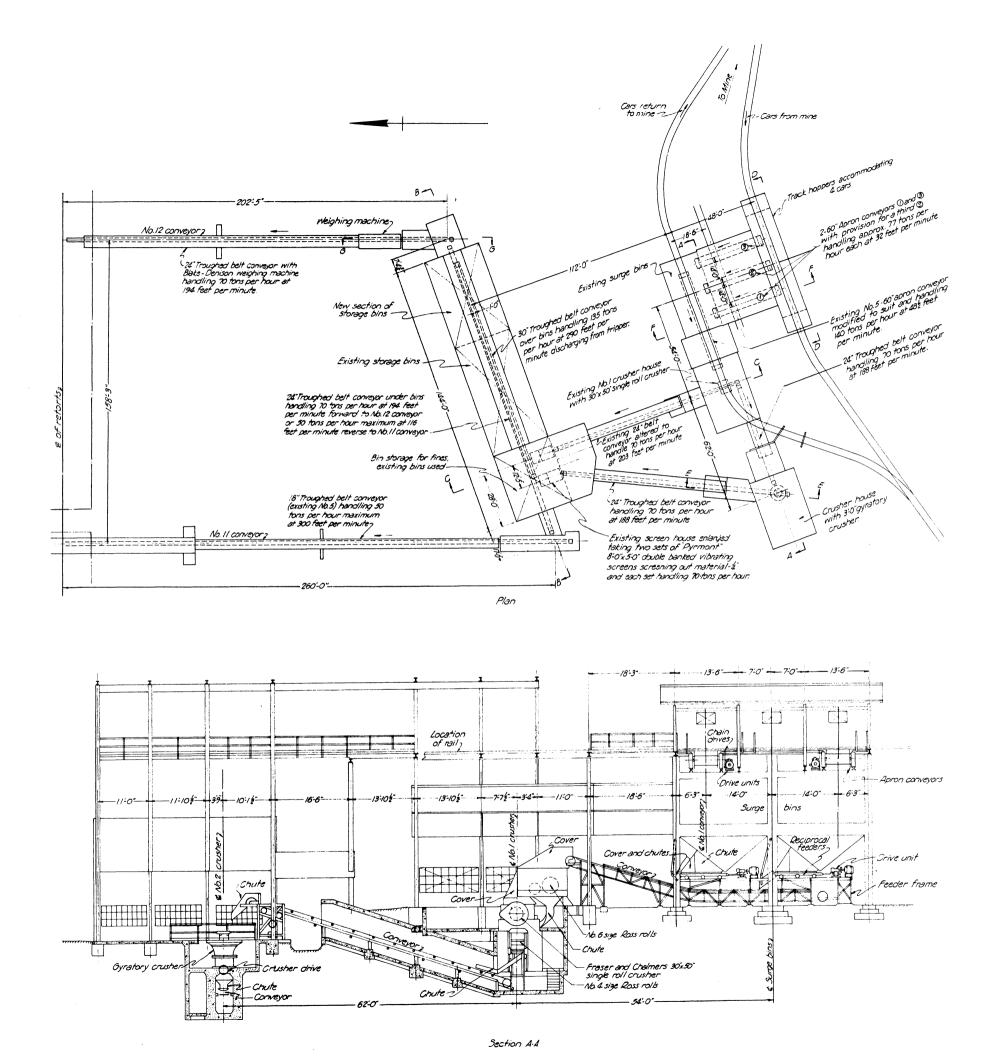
Layout of shale-handling plant, Glen Davis, New South Wales, Australia.
